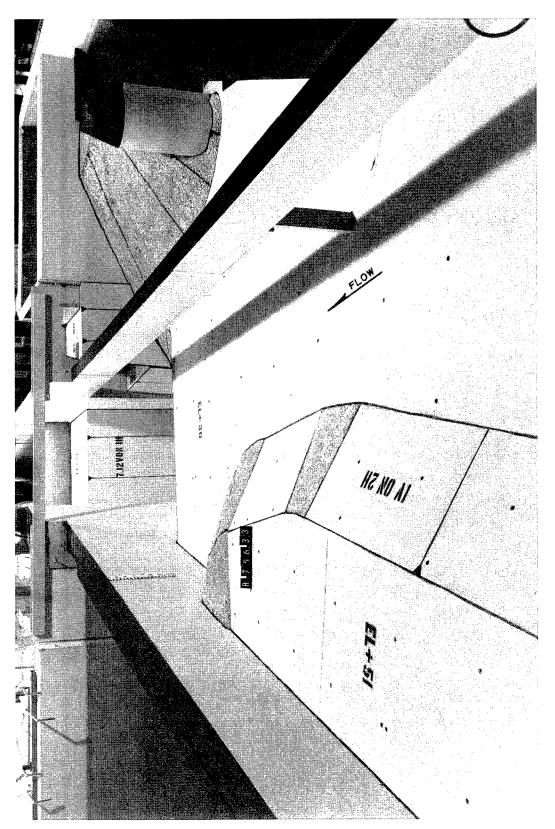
Upstream lock approach, type 2 design H-H pattern system, looking downstream
